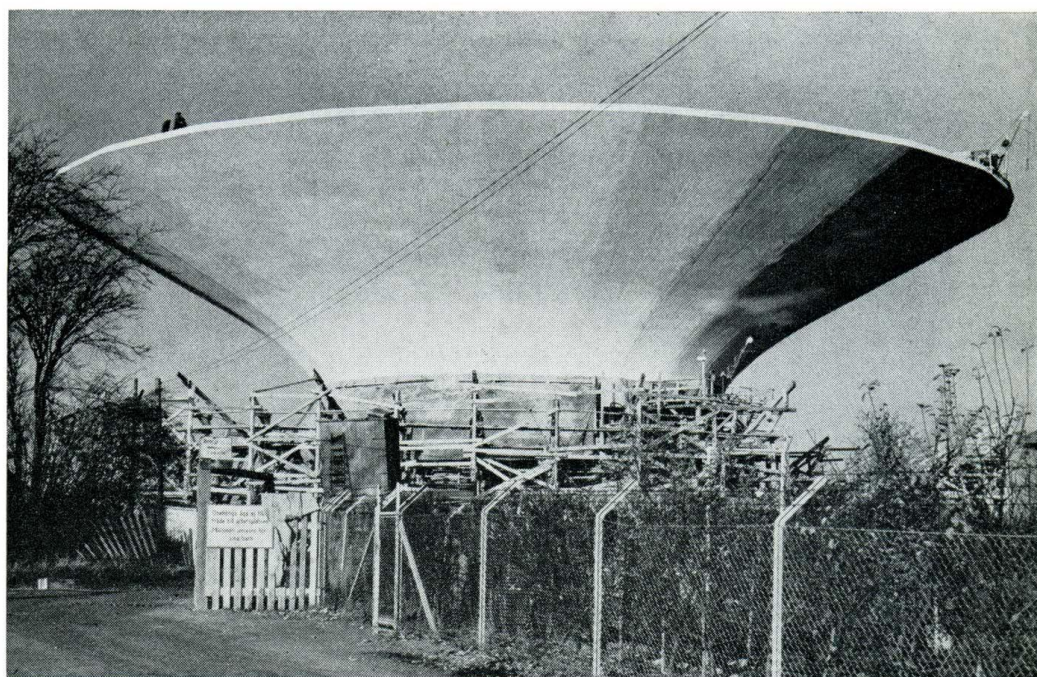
Construction of elevated water tower at Fredriksdal. Reservoir under lifting from ground. Contractor: Skånska Cementgjuteriet
